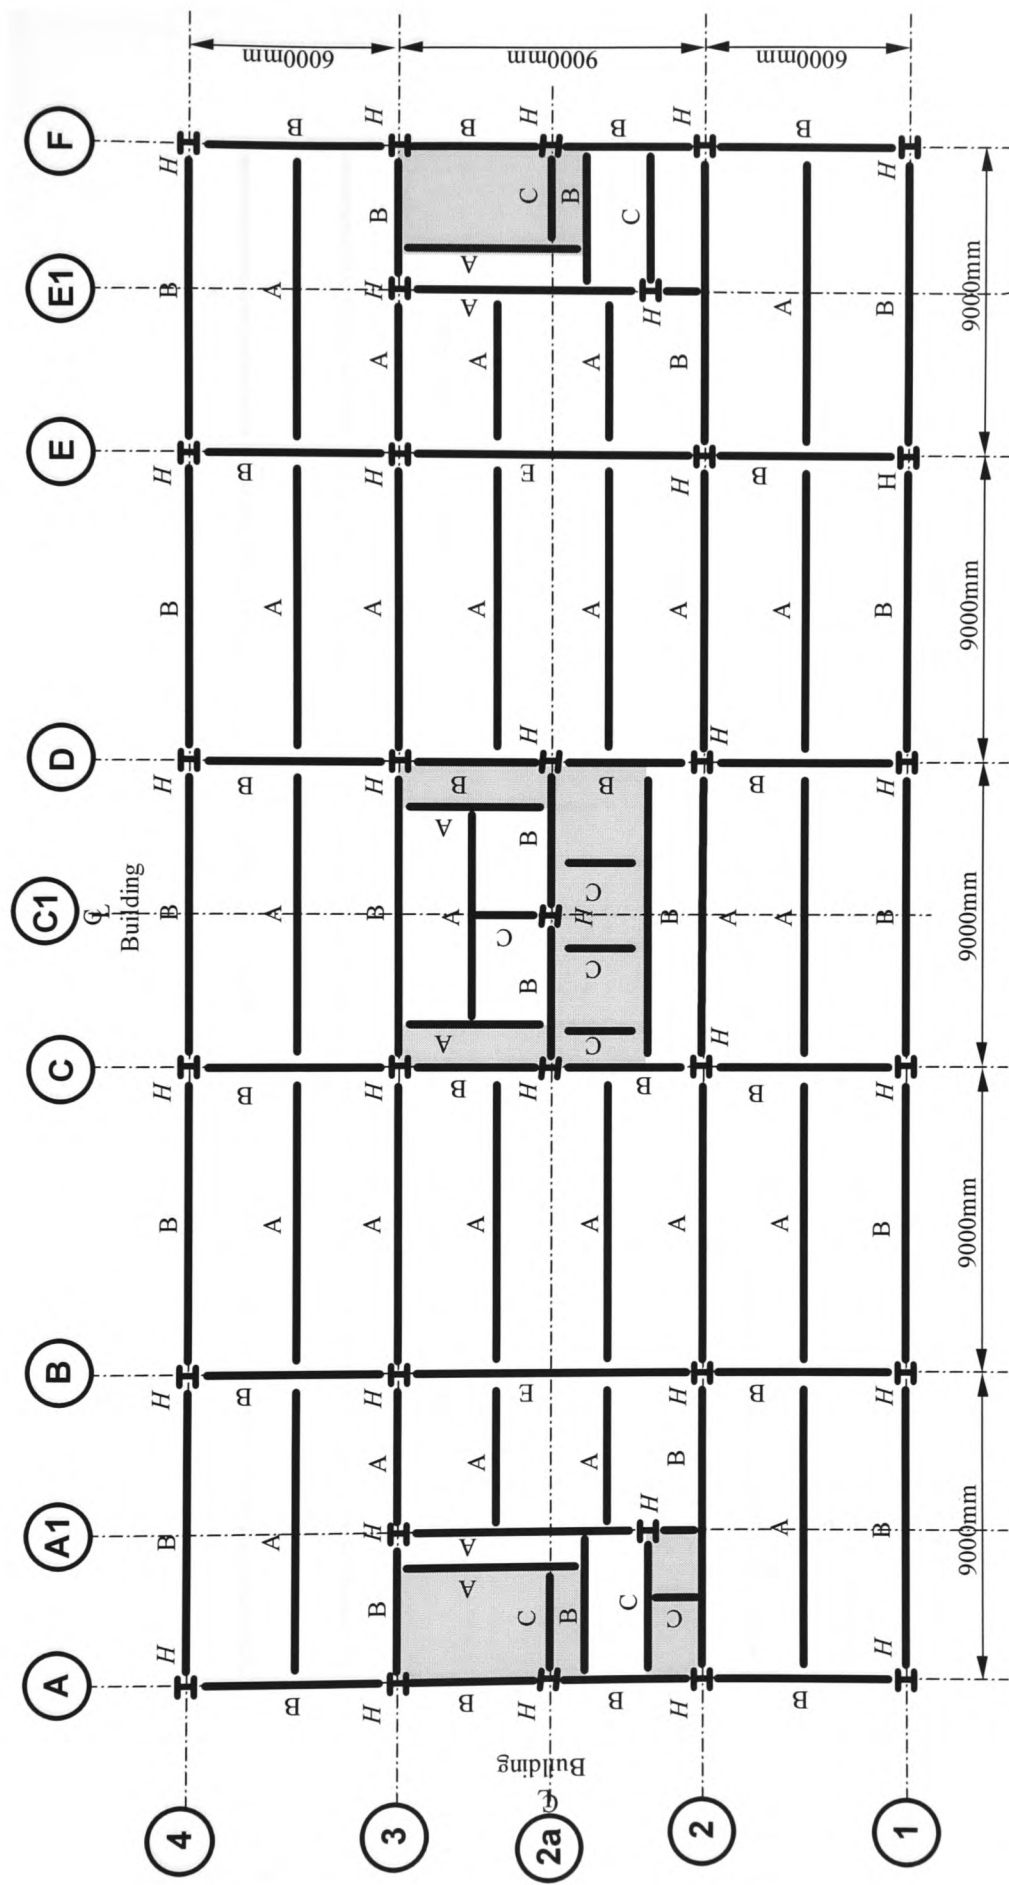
Plan on the 6th and 7th floors (similar) showing the general layout of the main structural elements
